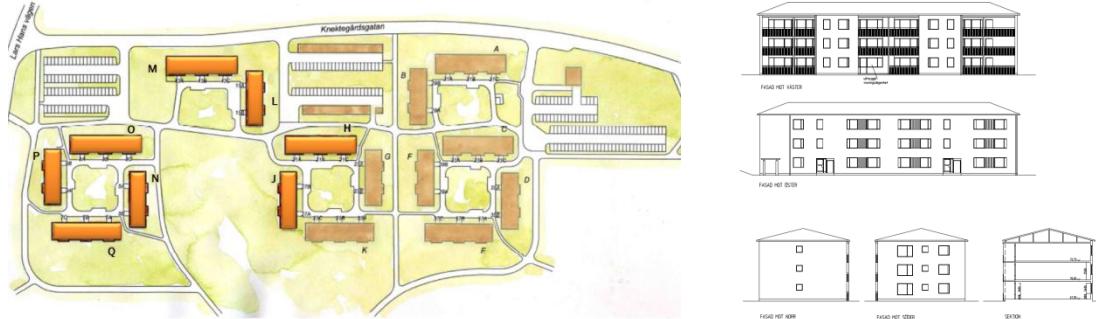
site plan – with in BEEM-UP involved buildings, elevations
